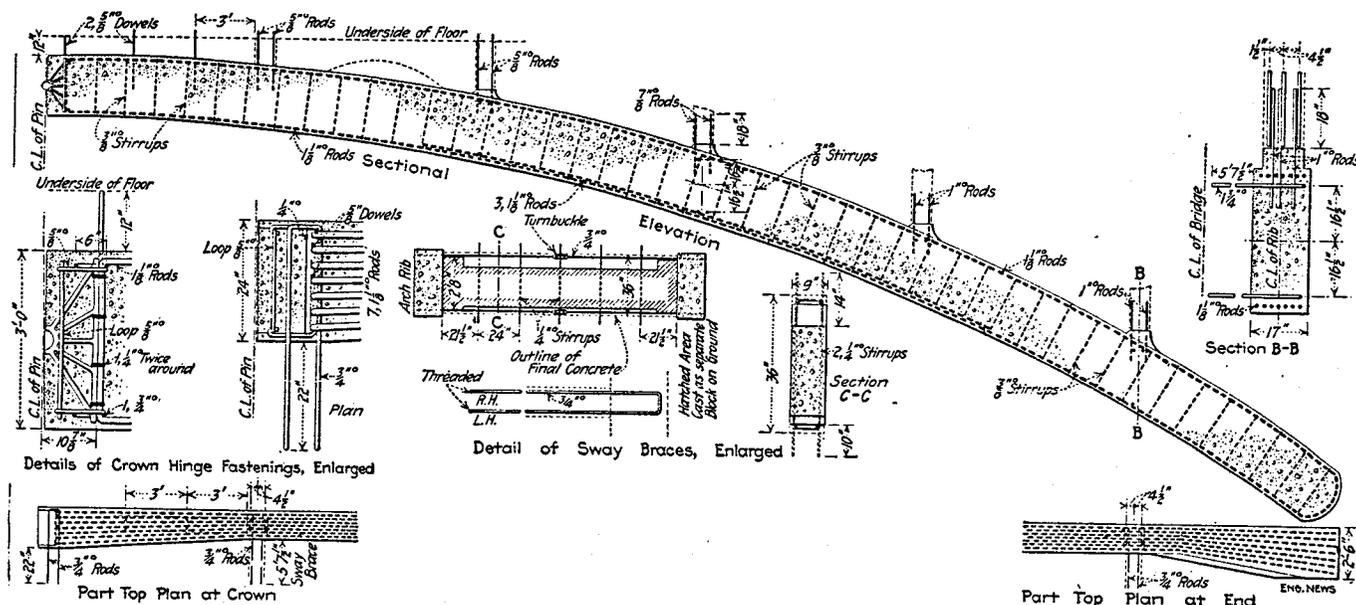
DETAILS OF ARCH-RIB CONSTRUCTION OF THE TEMPE BRIDGE
